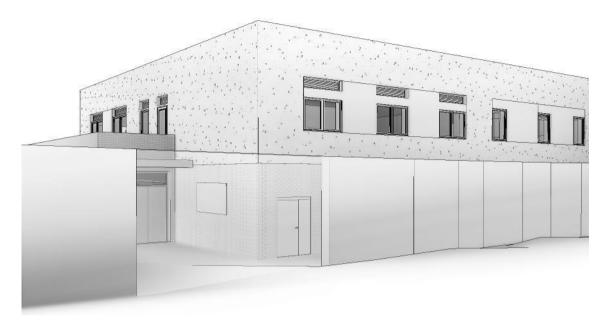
Indicative rendering from the north east on Charlton Park Road looking in through the school entrance gates in the listed wall with the proposed building behind
